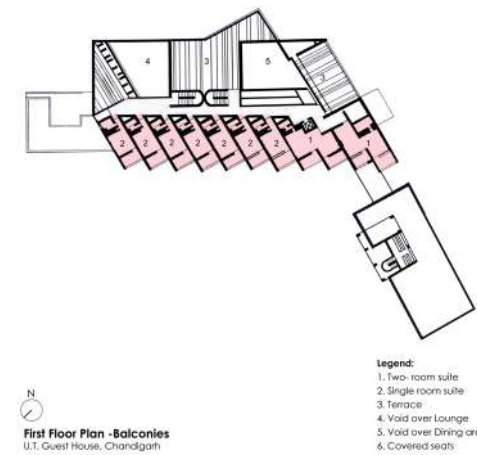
First Floor Plan of the U.T. Guest House showing the placement of the balconies
